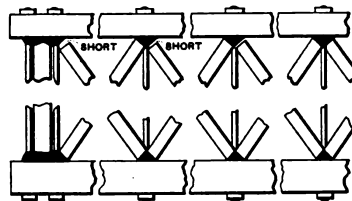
Section of Truss, Showing Slack to be Taken up.
